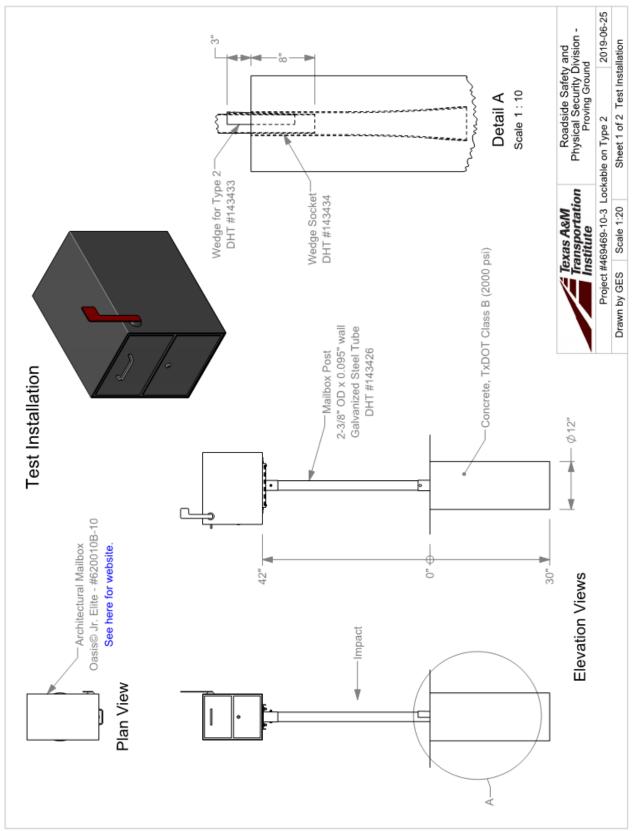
Overall Details of the Lockable Mailbox on Steel Tube Post.
